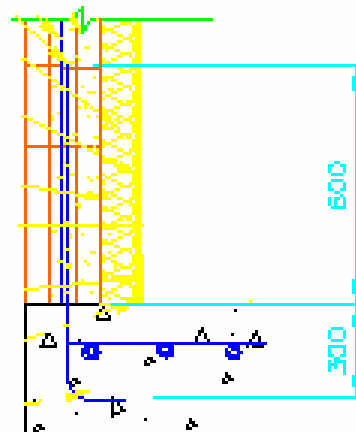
Typical Masonry Unit Construction. Details for a typical concrete masonry unit facility (Bergman, 2005)
